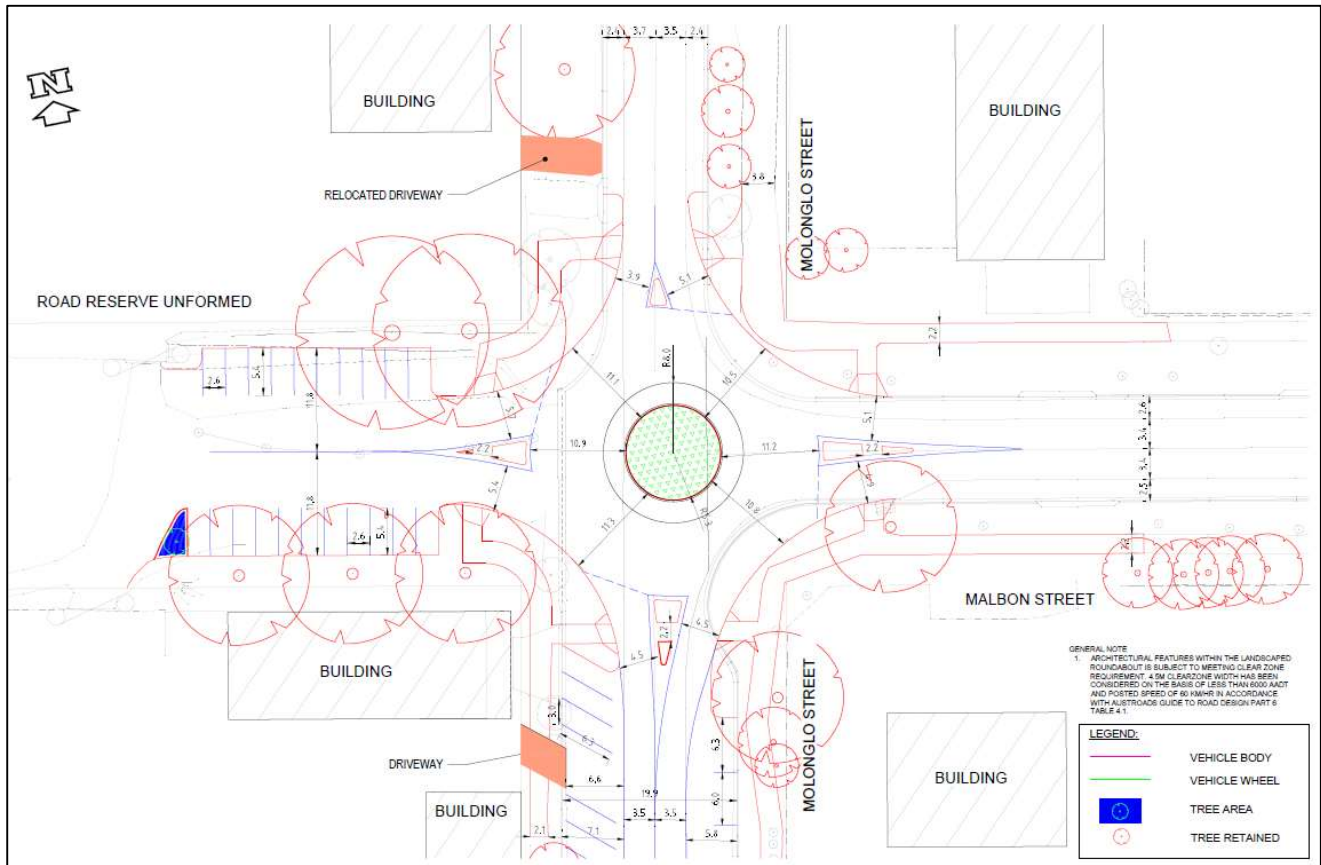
Roundabout plan showing the trees to be retained in red (trees to be removed are shown in grey).
